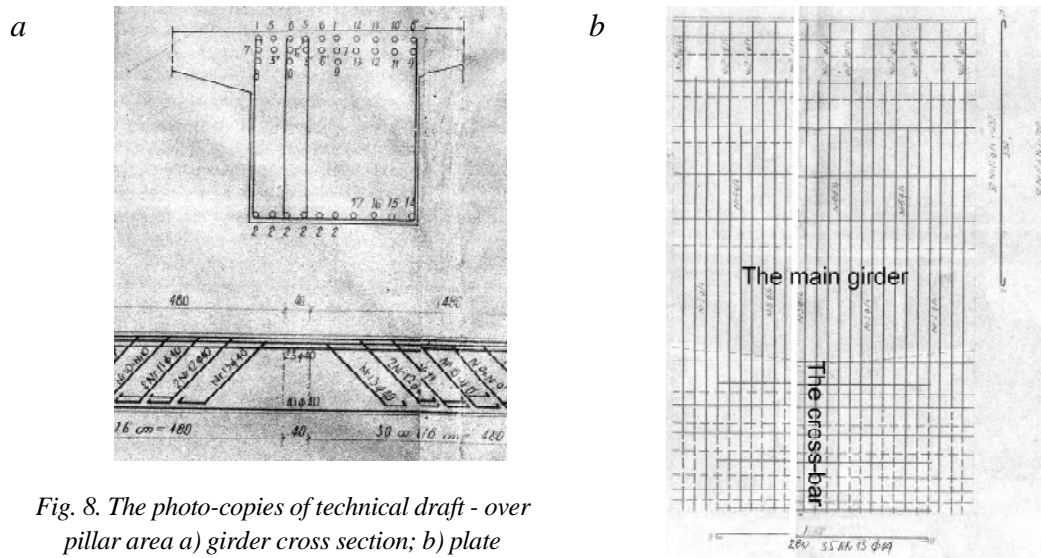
The photo-copies of technical draft - over pillar area a) girder cross section; b) plate reinforcement
